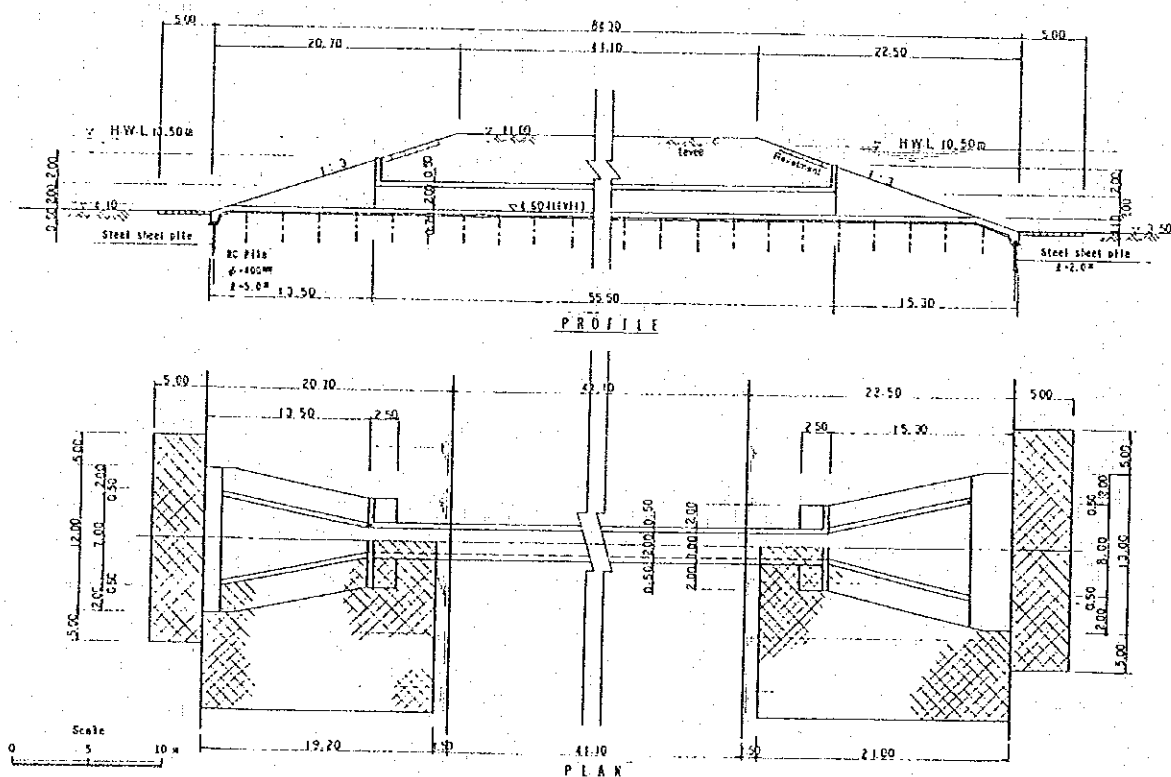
PROPOSED CONNECTING CULVERT BETWEEN R-3 AND R-4 REGULATING PONDS
